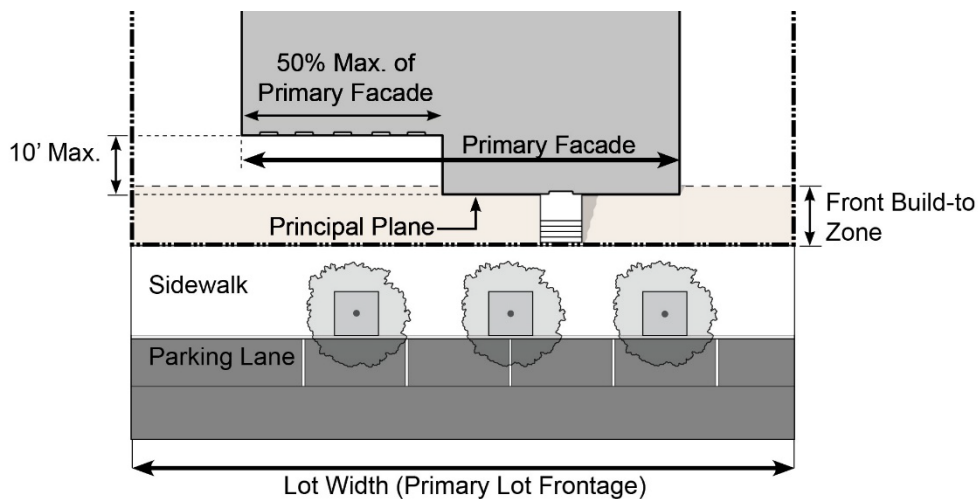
e.1.iv: Frontage Occupancy: Primary Façade and Permitted Setback (outside of the Downtown Historic Overlay)
